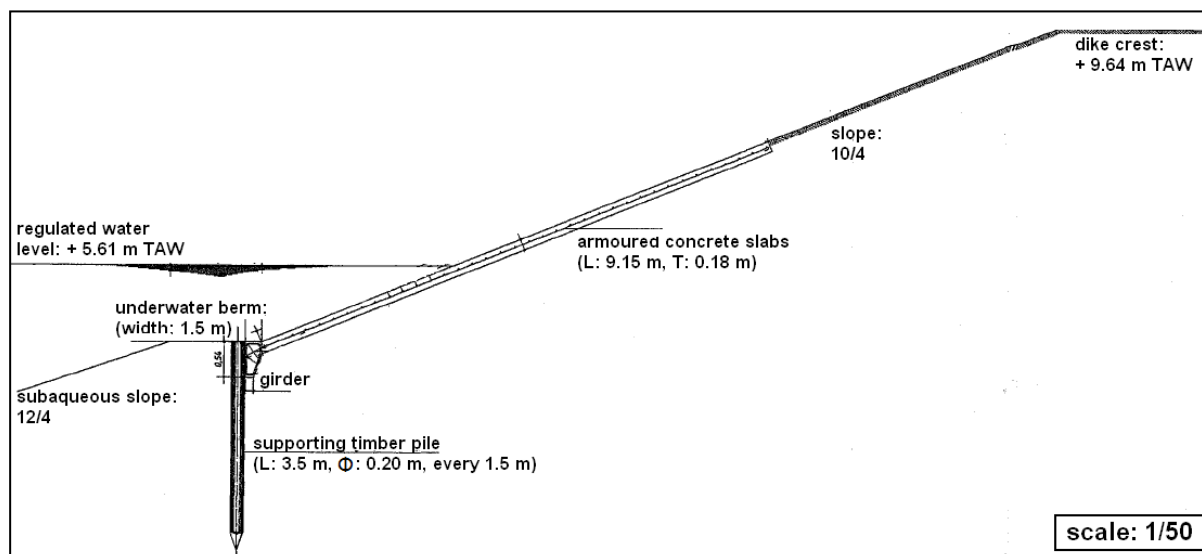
Cross section of the right bank at the measurement location: bank protection by means of armoured concrete slabs (adapted from drafts of W&Z)
